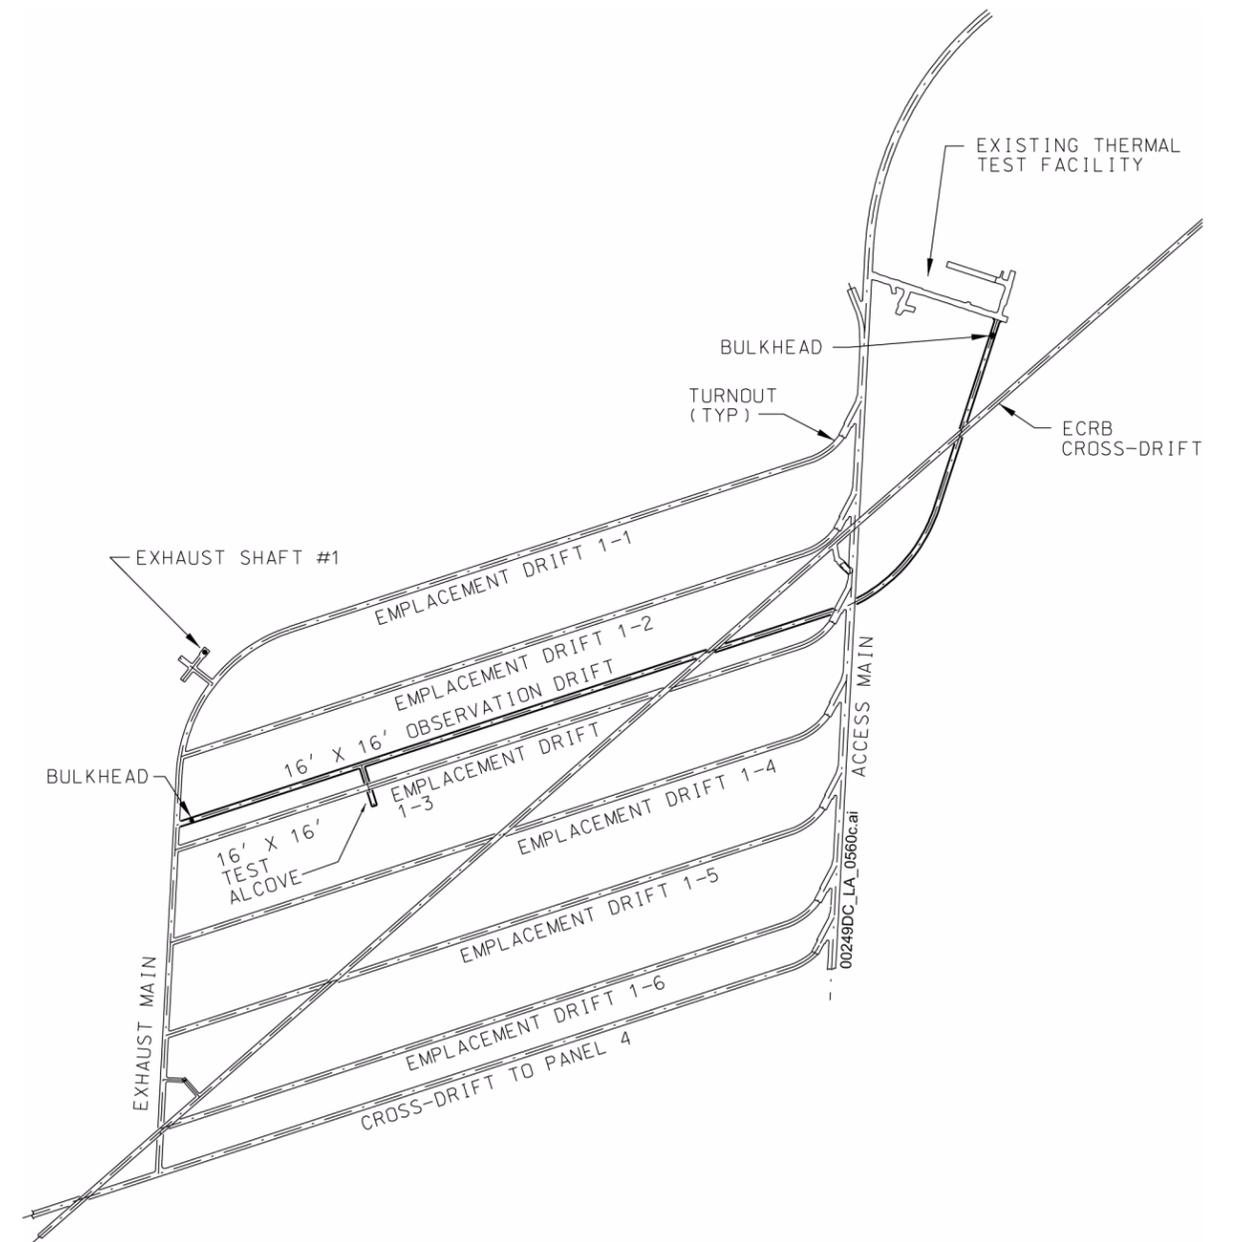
Observation Drift and Test Alcove Plan View
